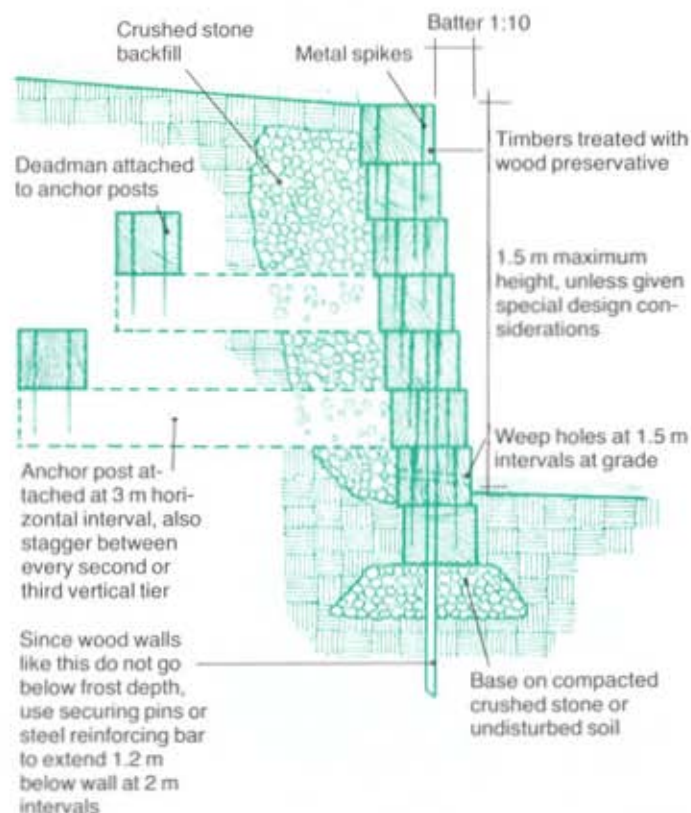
An example of a timber retaining wall that may be constructed from railroad ties or rough sawn timbers. Unless the timbers have been previously pressure-treated, they should be painted with a wood preservative on site.
